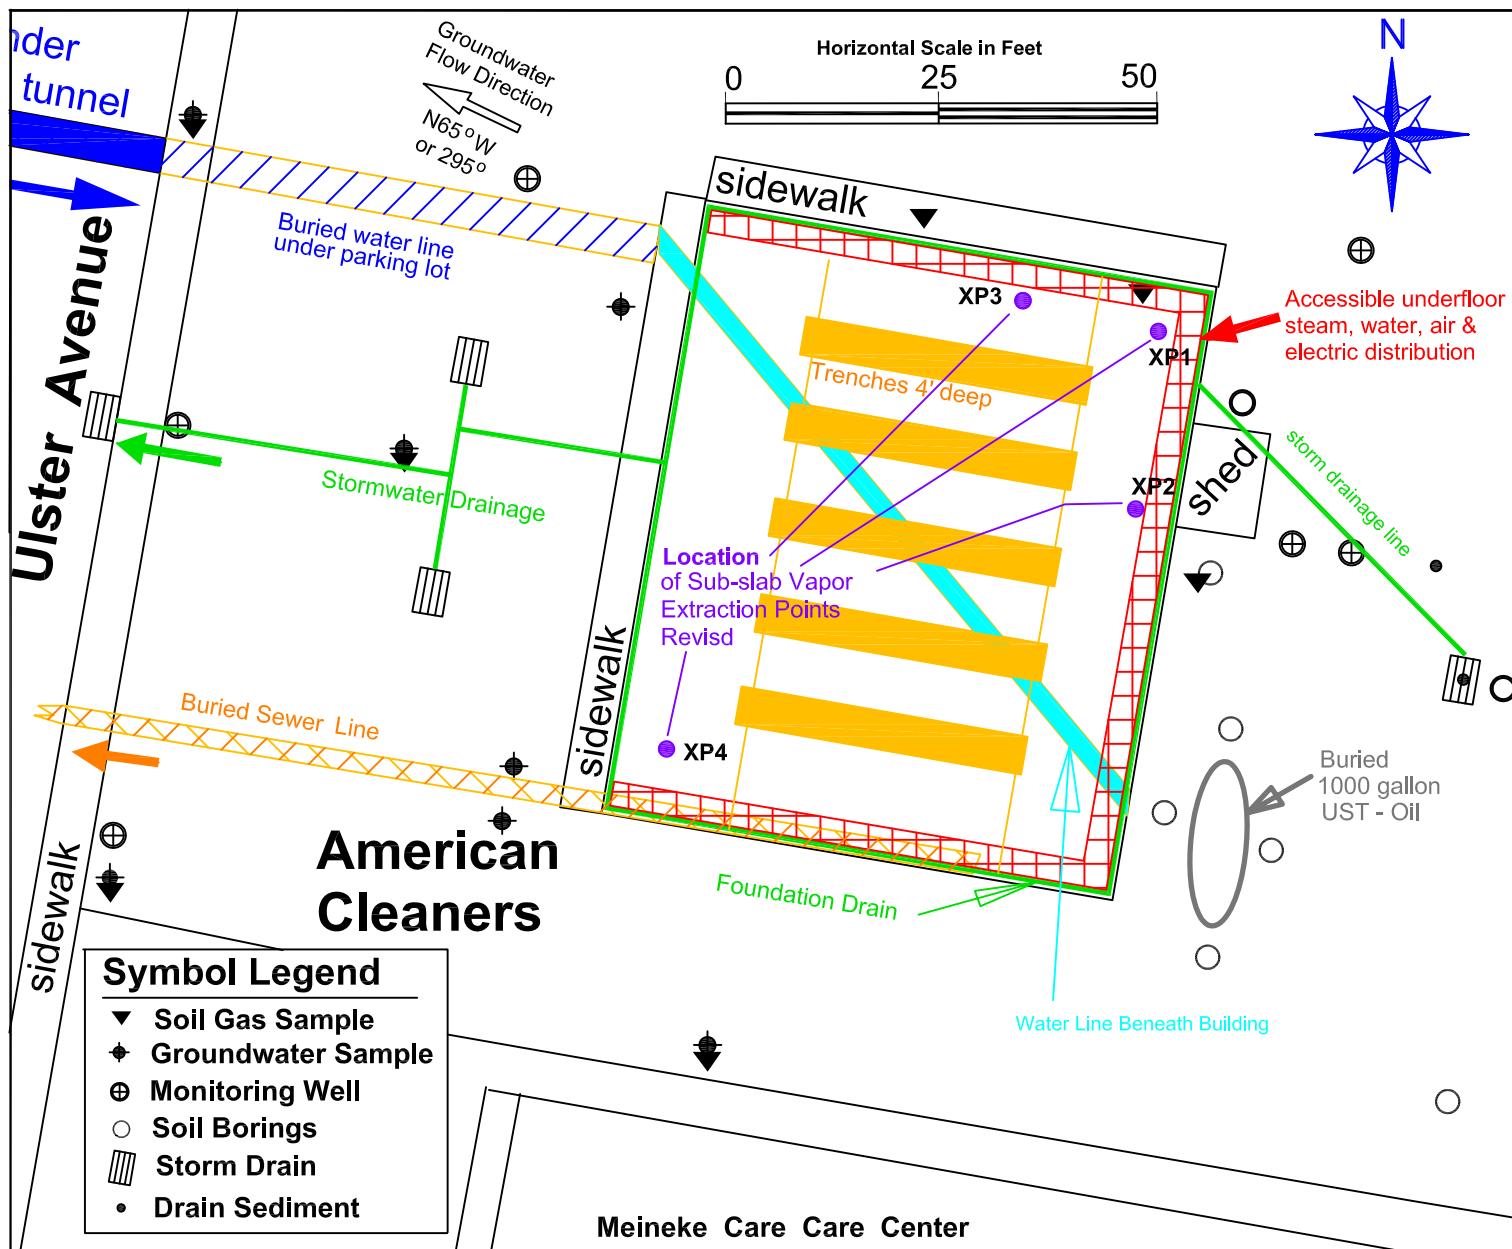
Location of Sub-Slab Vapor Extraction Points on Site Plan of Building showing Features Constructed for Dry-Cleaning Operations American Cleaners Inc, 734 Ulster Avenue, Kingston, NY NYSDEC DER VCP Site V-00601-3 December 31, 2009 Revised November 2013
